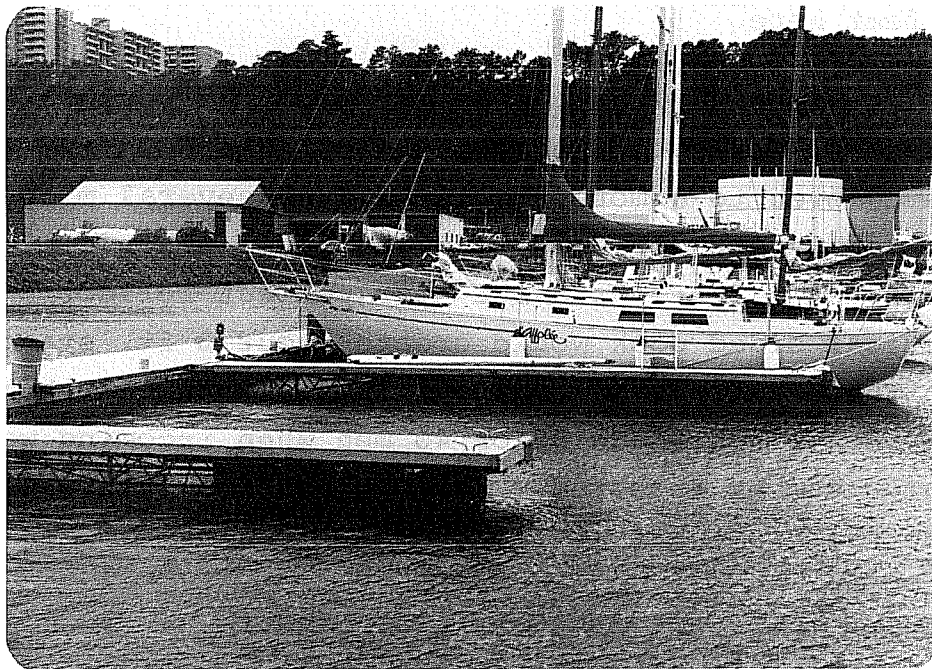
Fingers supported by steel drums at Quebec Yacht Club.
